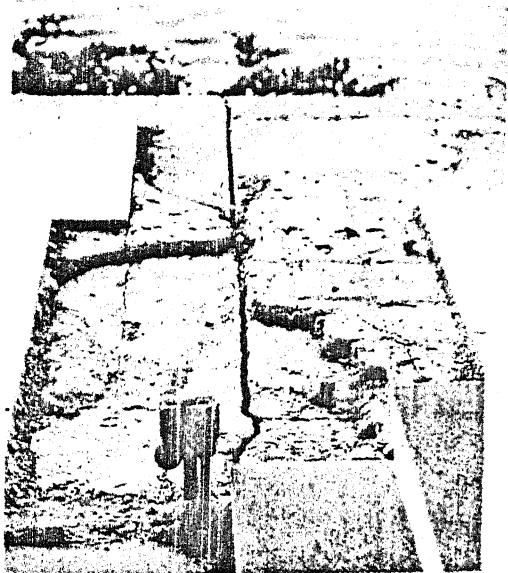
Crack in Floor, Bahia Del Mar
